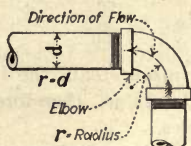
Turn In Pump-Piping Made With Elbow Having A Radius Equal To Pipe-Diameter.
